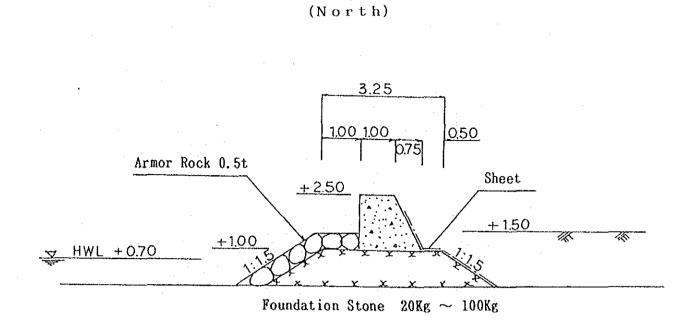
Typical Cross Section of North Breakwater (Section A'-A')
